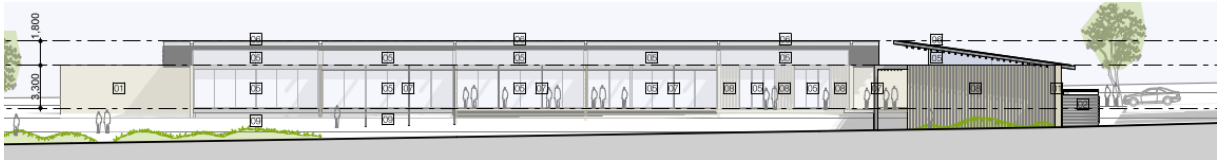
Western elevation of the chocolaterie building. Source: Application documents.
